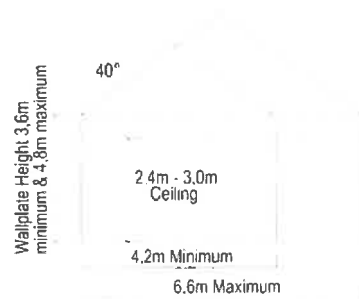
Section illustrating prescribed height for a Type II Erf Building
